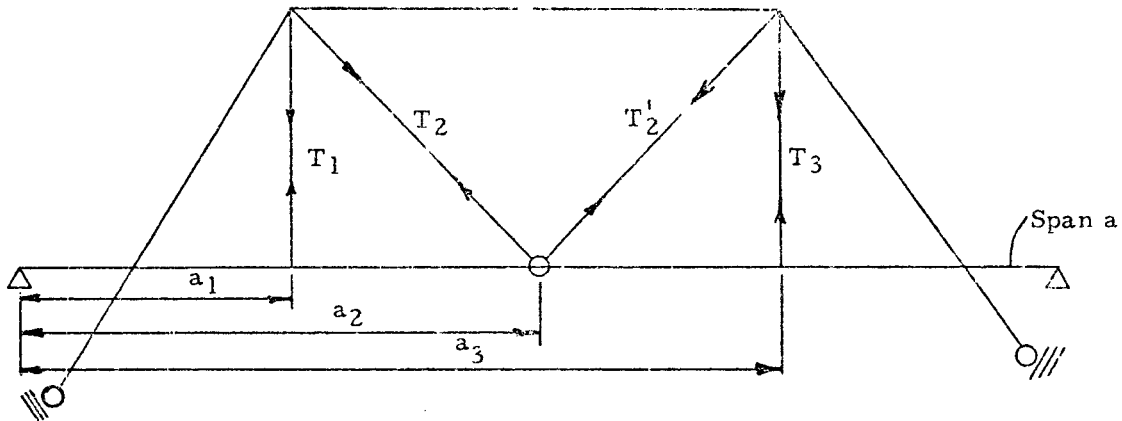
FRAME BRIDGE WITH HINGE, ELEVATION VIEW
